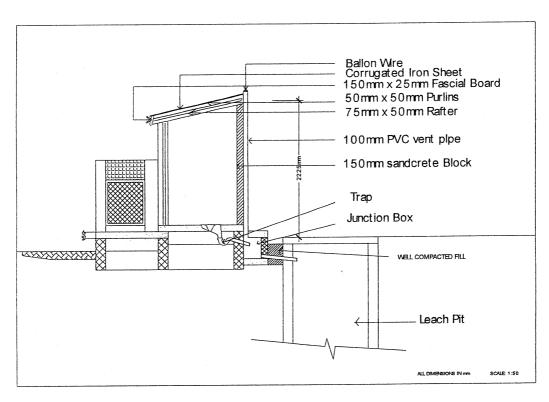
Cross Section of the Pour Flush toilet showing details of the pan, trap, junction box and pit
